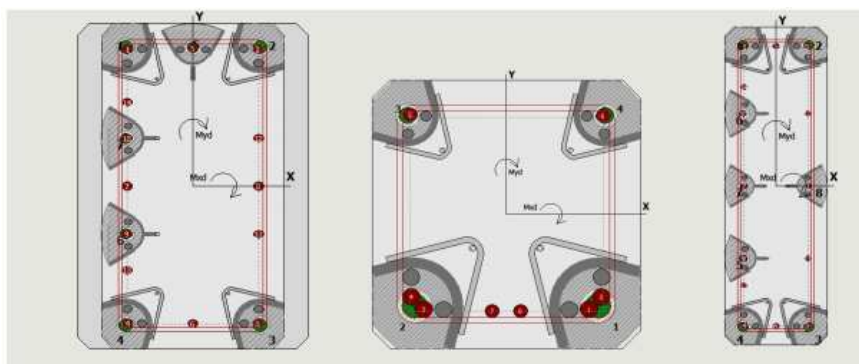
AHK and AHK-K shoes in asymmetrical rectangular column connections (14)
